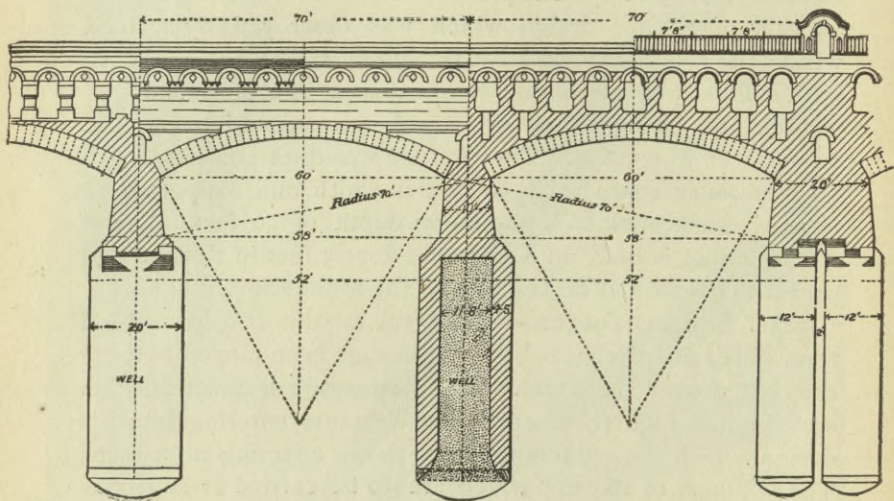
PLATE XXII.—ELEVATION AND CROSS-SECTION OF NADRAJI AQUEDUCT, LOWER GANGES CANAL, INDIA.
